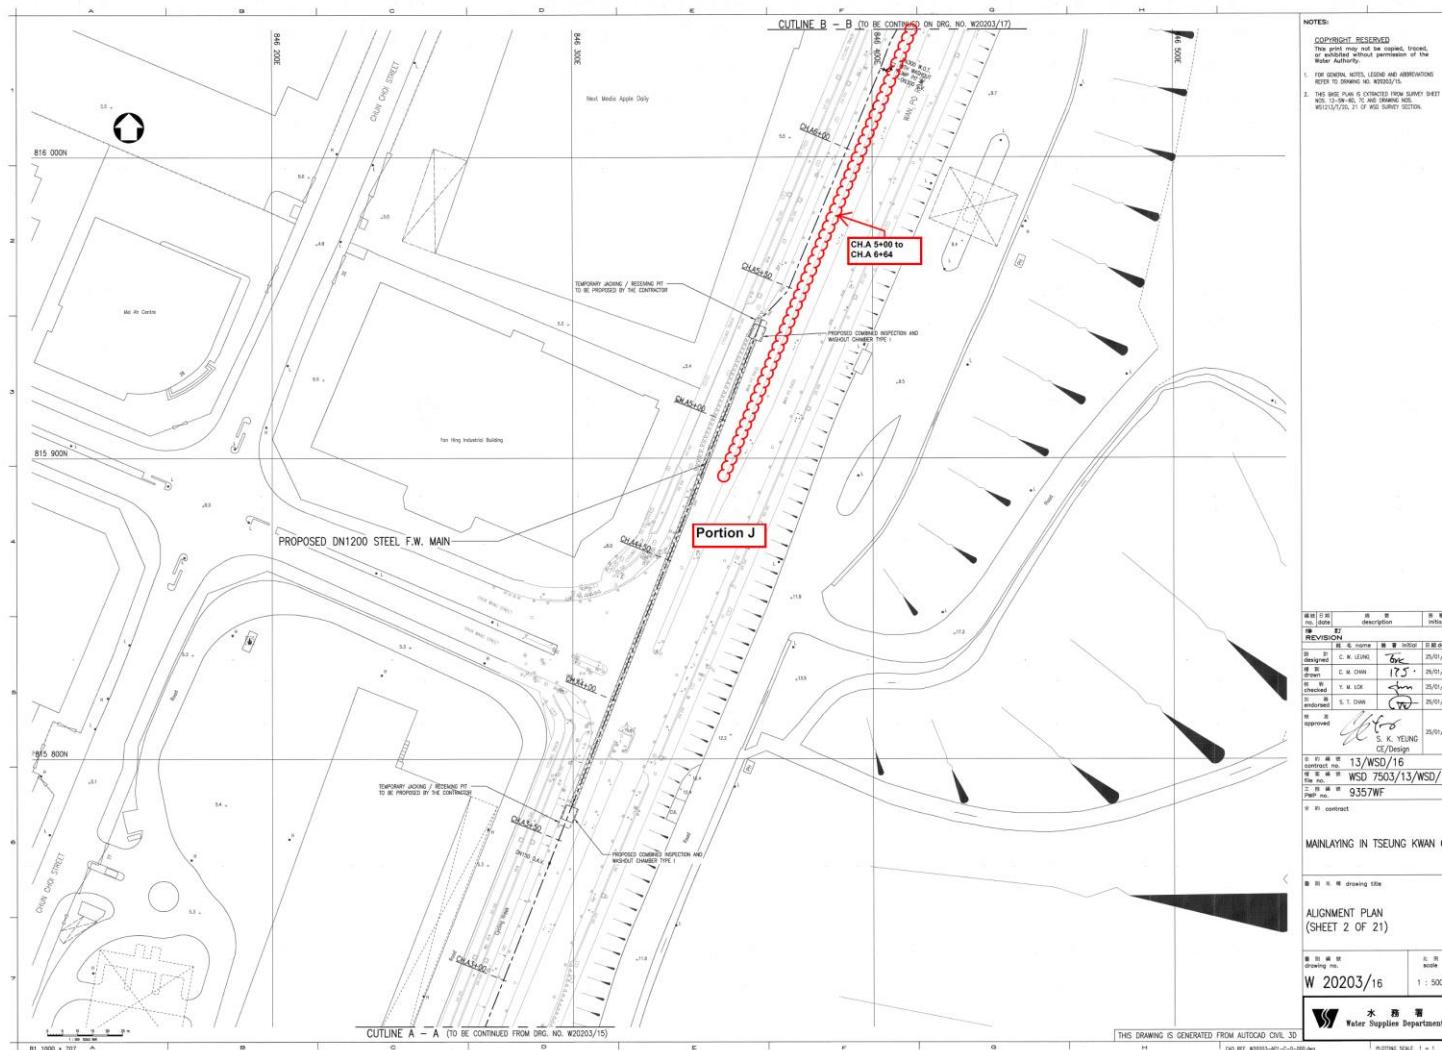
Location Plan for Portion J - CH.A 5+00 to CH.A 6+70
